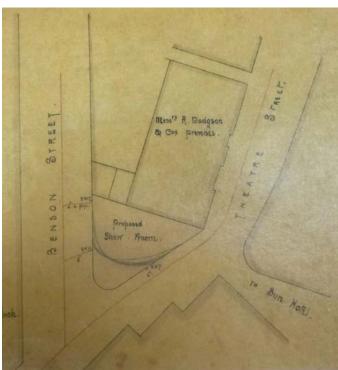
Location plan of proposed showroom, dated 1873 (north is to the right)
